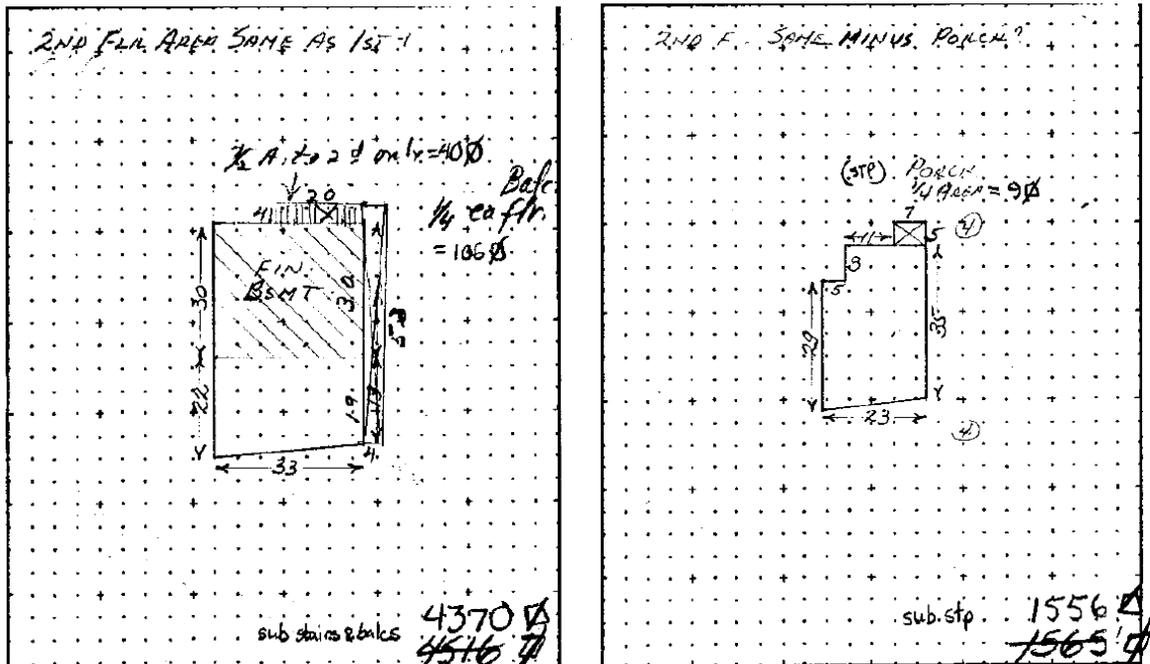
Floor plans of Building 1 (left) ca. 1962 and Building 2 (right) ca. 1961.
